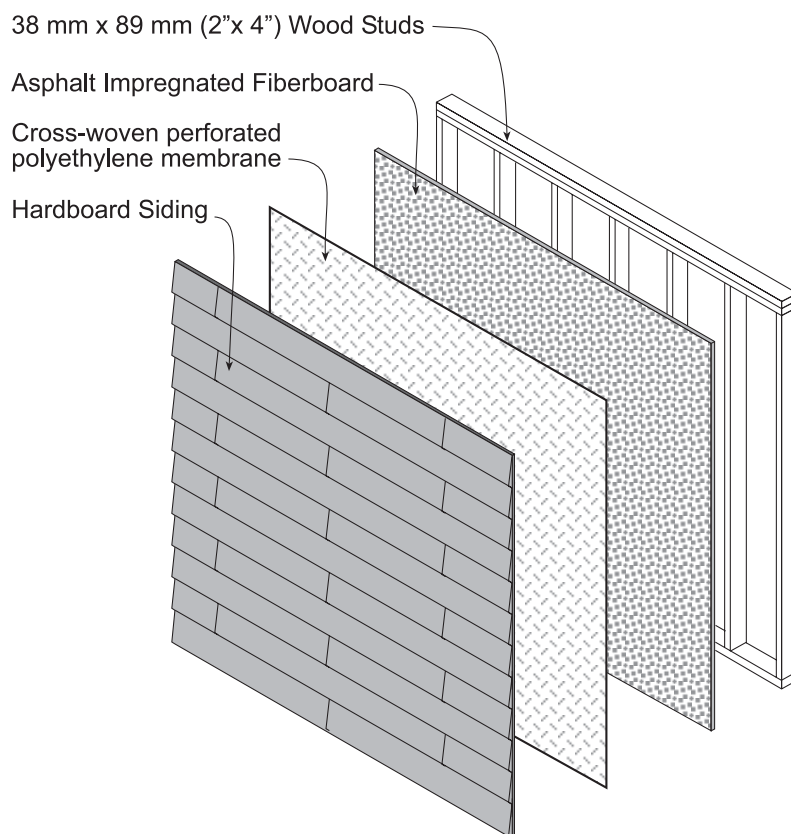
Hardboard siding-clad wall assembly (specimen No. 15) with no cavity behind the siding
